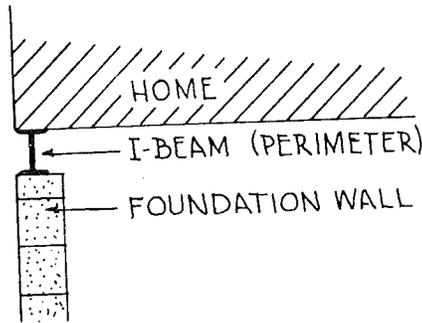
The I-beams of a perimeter frame rest on the foundation wall.
